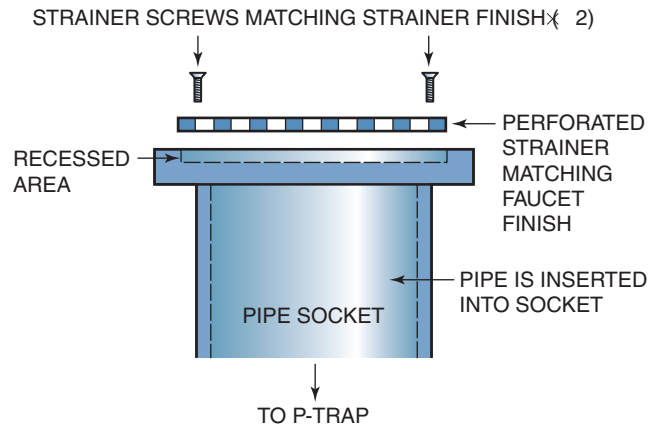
A one-piece shower drain is installed when a tile shower base is constructed on a concrete floor.
